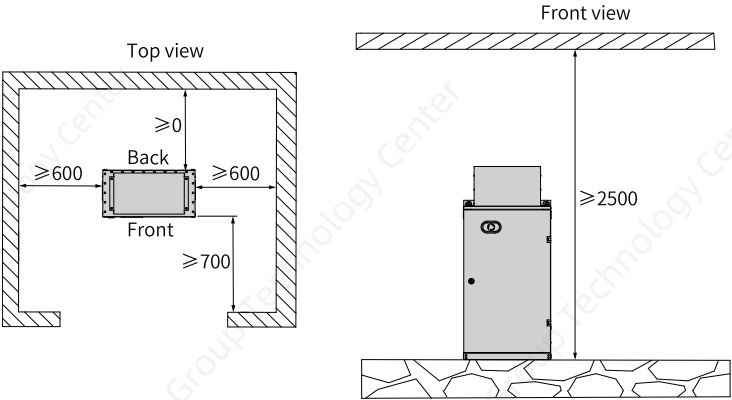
Mounting clearance requirements of the MR control cabinet (Unit: mm)
